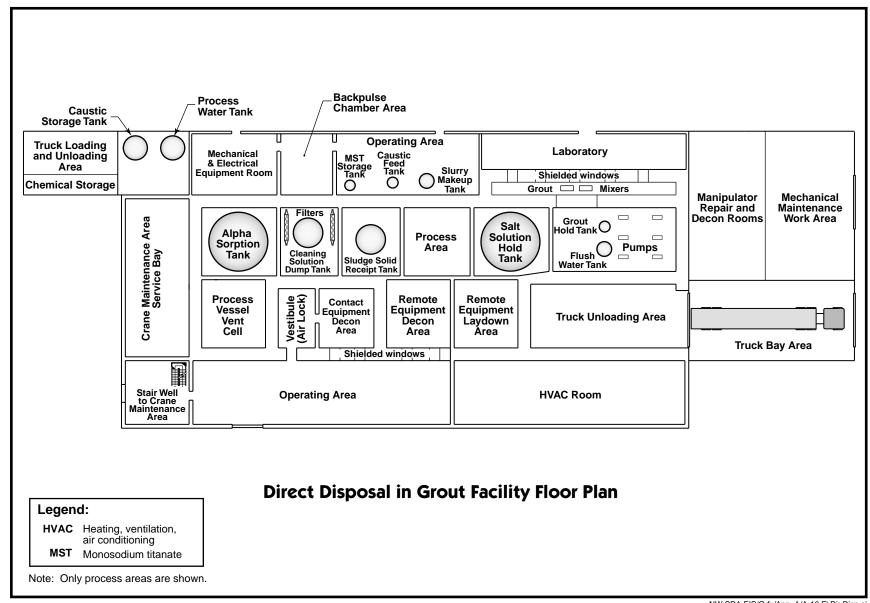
Floor plan for Direct Disposal in Grout facility.
